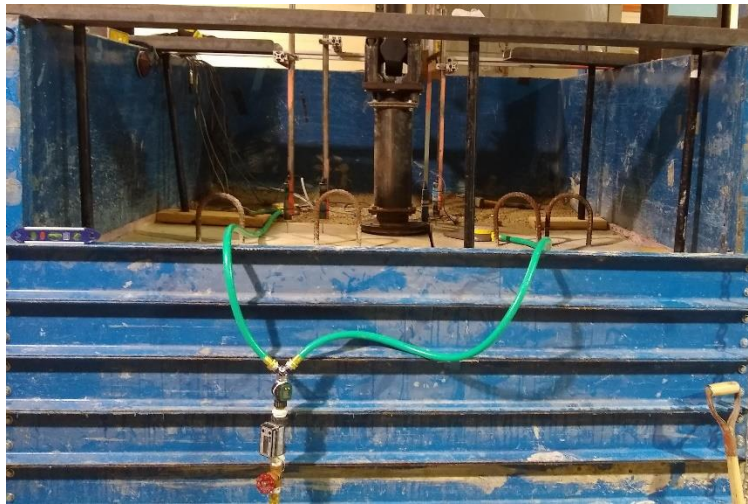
Big Box Layout with Concrete Slabs, Top View.
